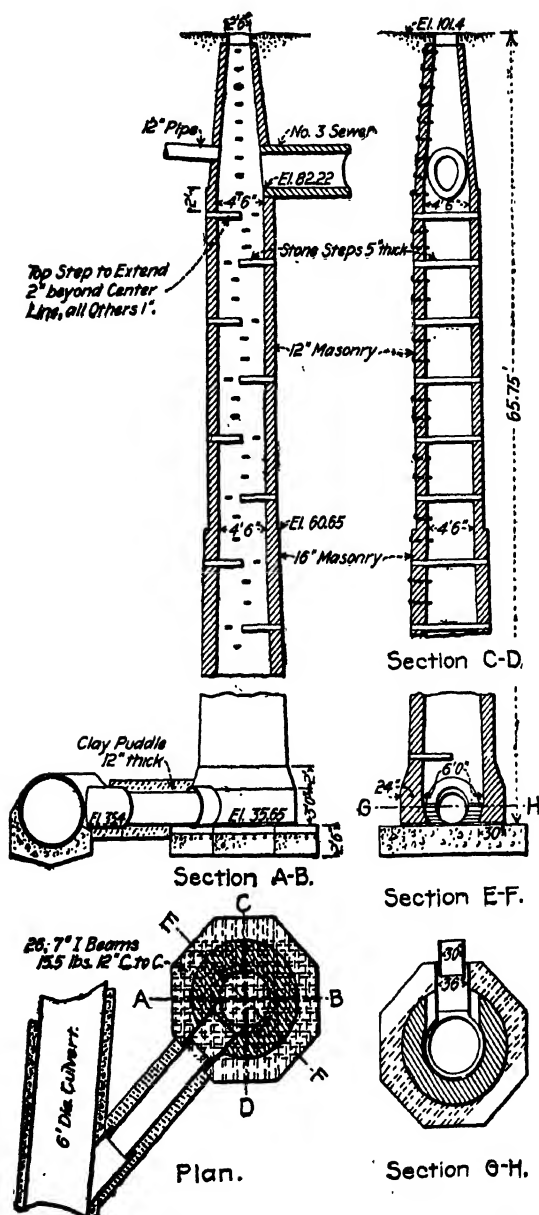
Wellhole, Petrie Street sewer, Cleveland, Ohio.
